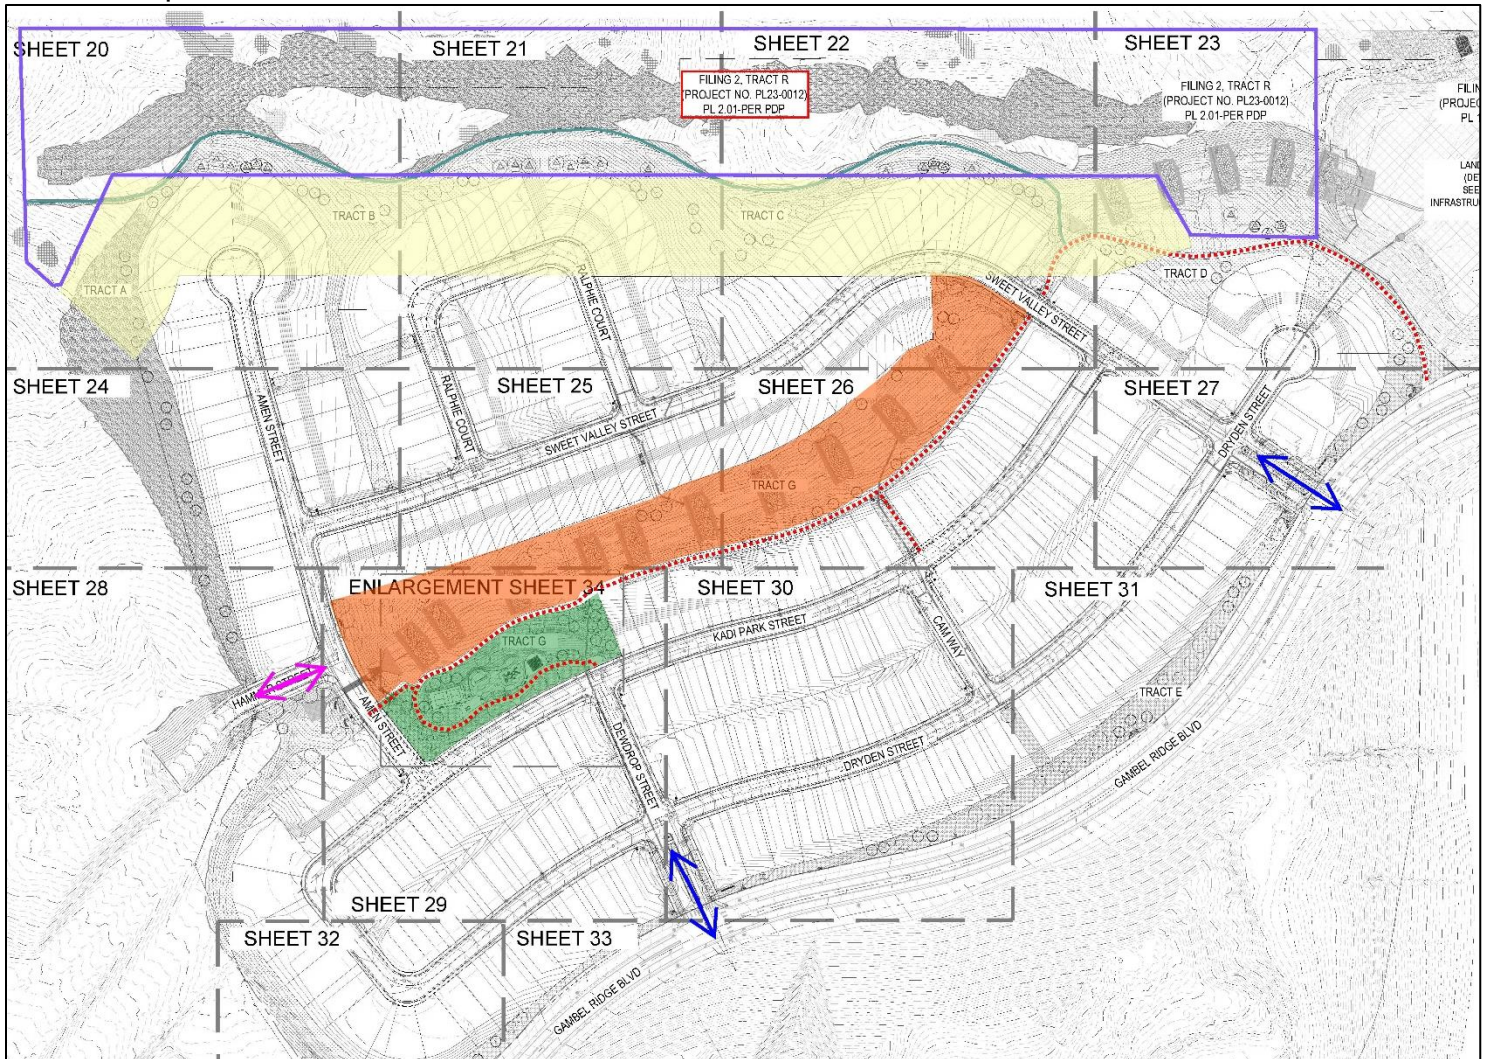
Dawson Trails Planning Area B1 Site Development Plan
